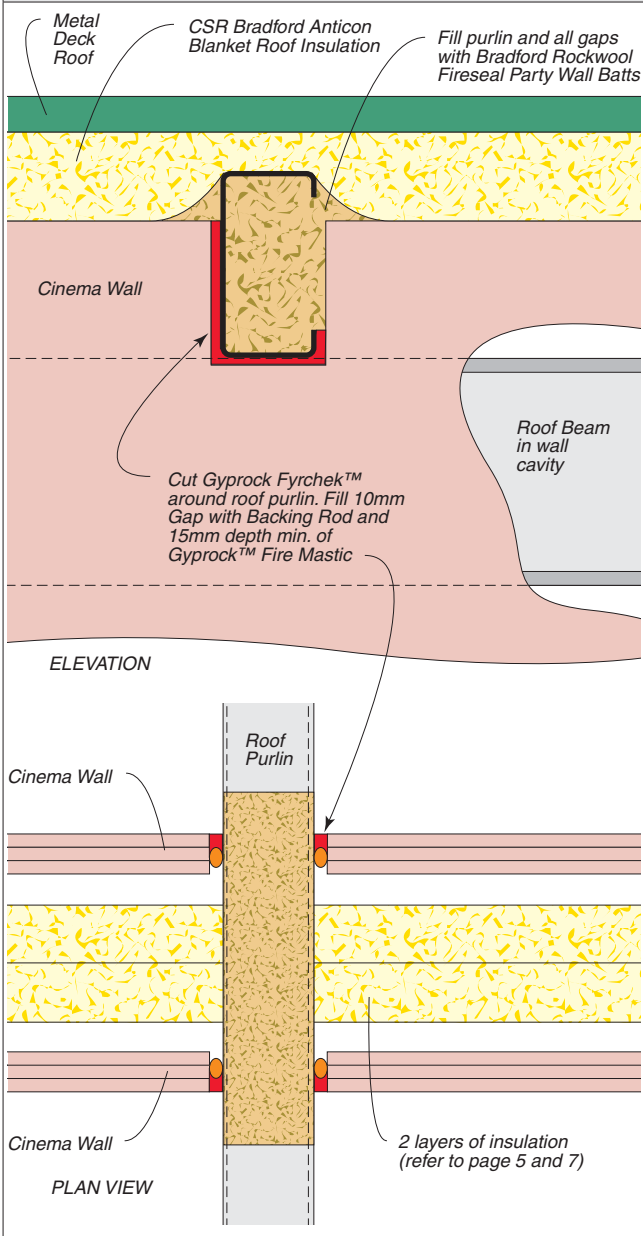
ALTERNATIVE WALL HEAD DETAIL.
